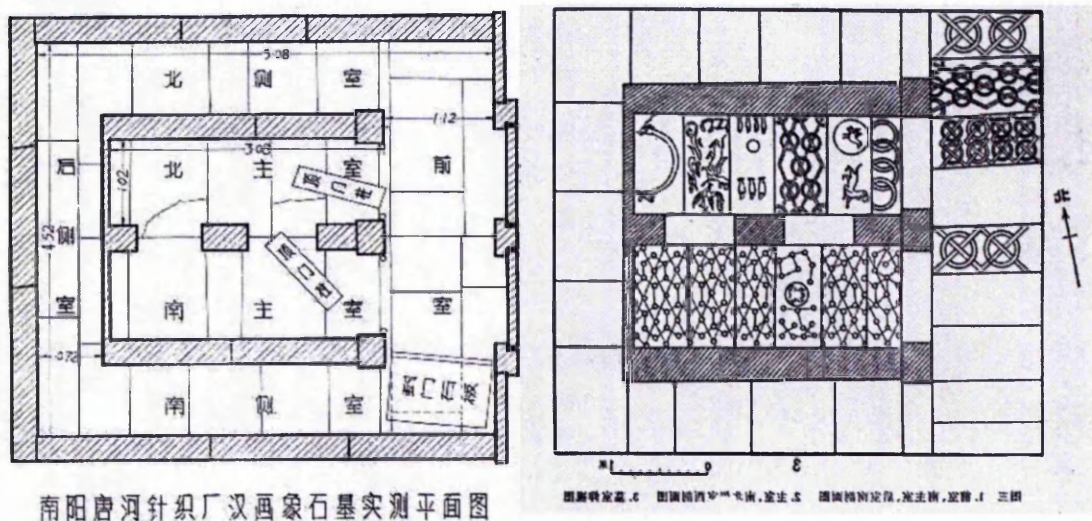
(left): Floor plan of M1 at the knitting factory M1, Tanghe, Henan Province.
